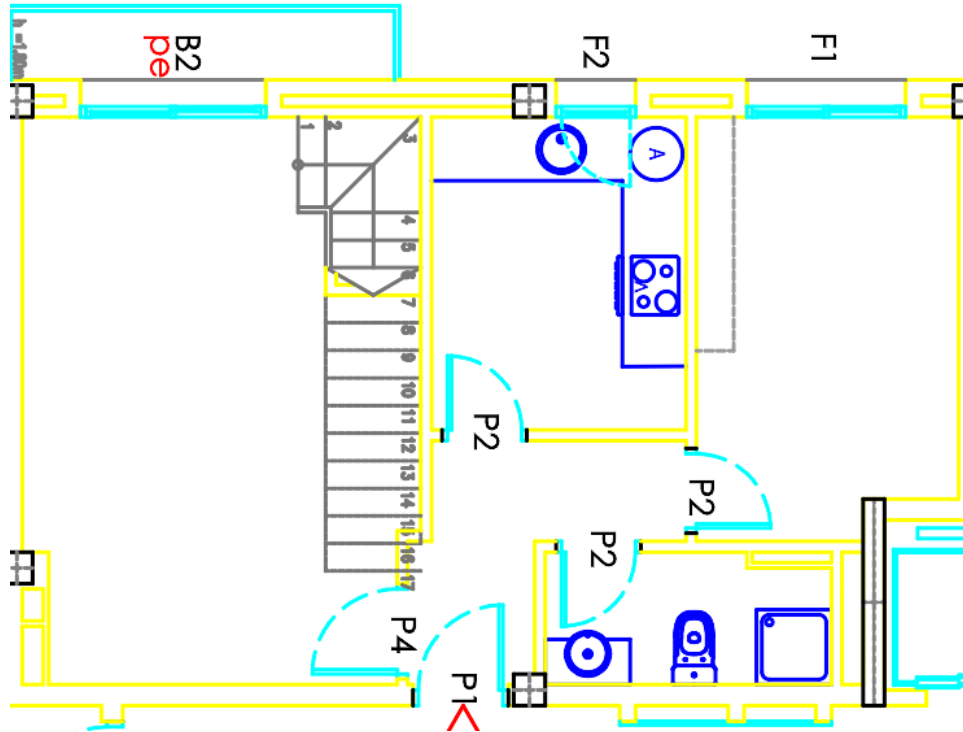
FLOOR PLAN OF THE BOTTOM FLOOR OF APARTMENT 3 MENTIONED IN TABLE 2.20
